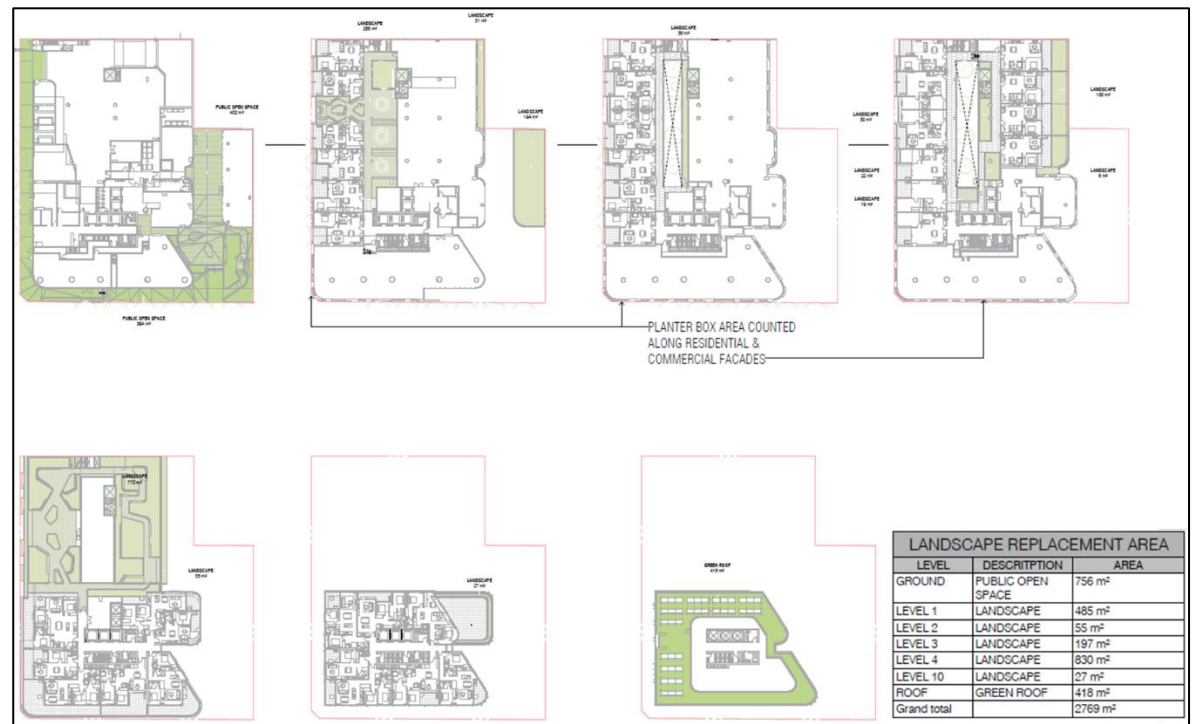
| Landscaped area (Source: Applicant’s Landscape Drawings Revision B dated 15 December 2023)
